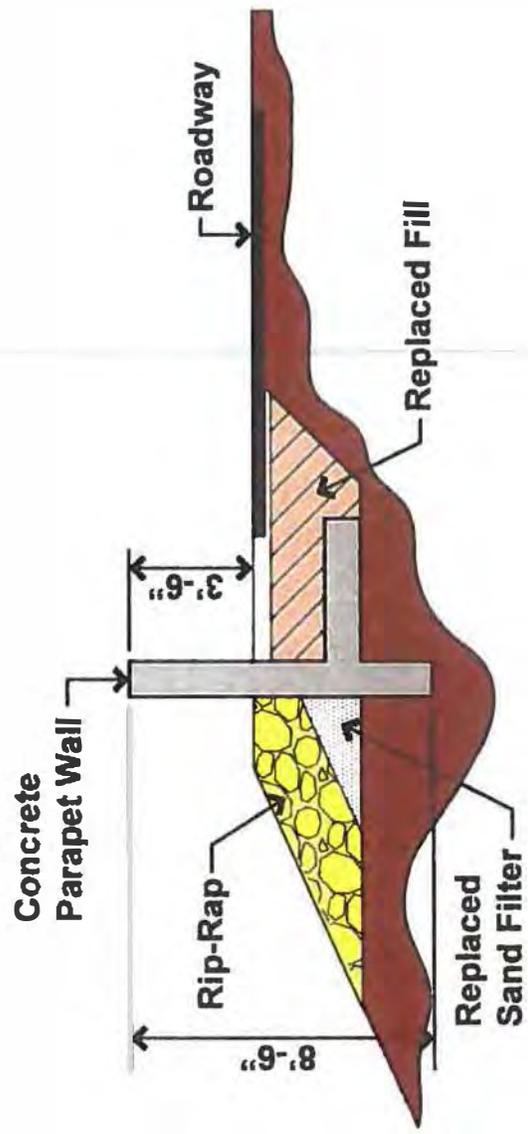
Conceptual illustration of a 3.5 foot reinforced concrete floodwall
